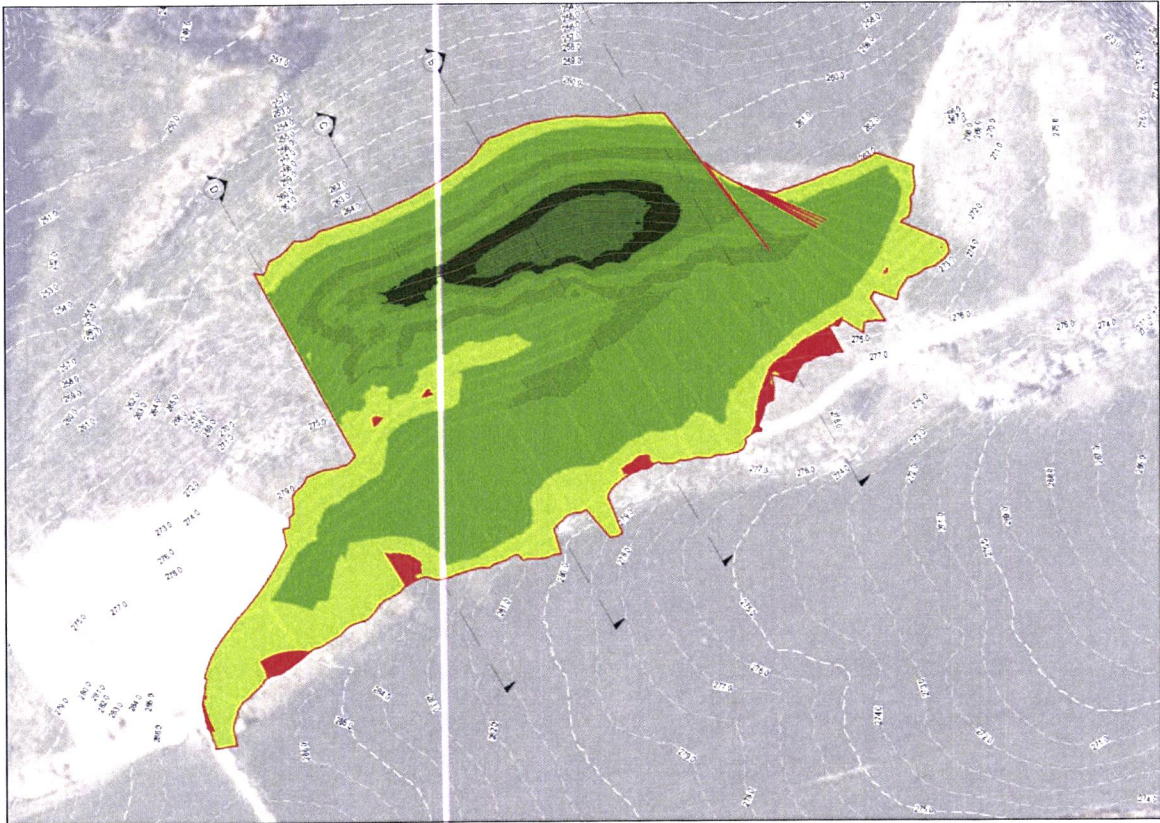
Area of proposed infill and levels (image cropped from Appendix)
